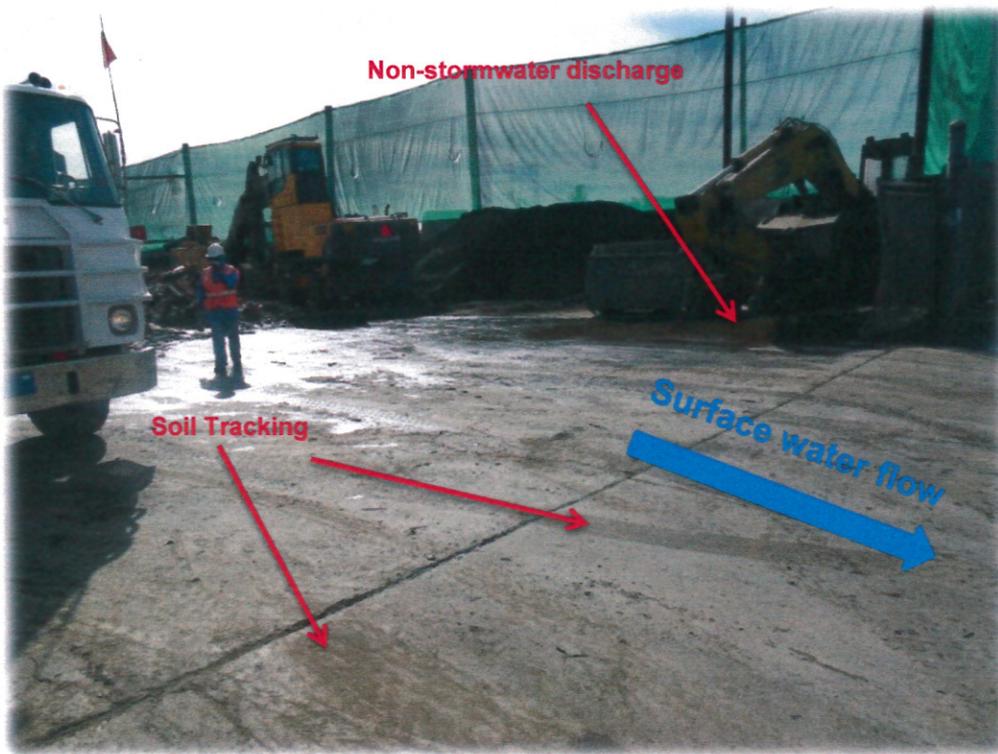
Standing on Pendleton Street, facing south. A pile of soil located about 30 feet away from Pendleton Street. Evidence of non-stormwater discharge and soil track-off onto Pendleton Street was observed. Pendleton Street is to the right of the photo.
